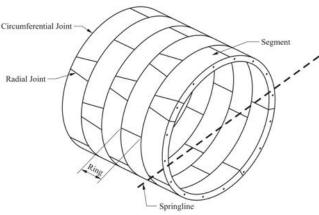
Typical Precast Concrete Segmental Tunnel Lining
